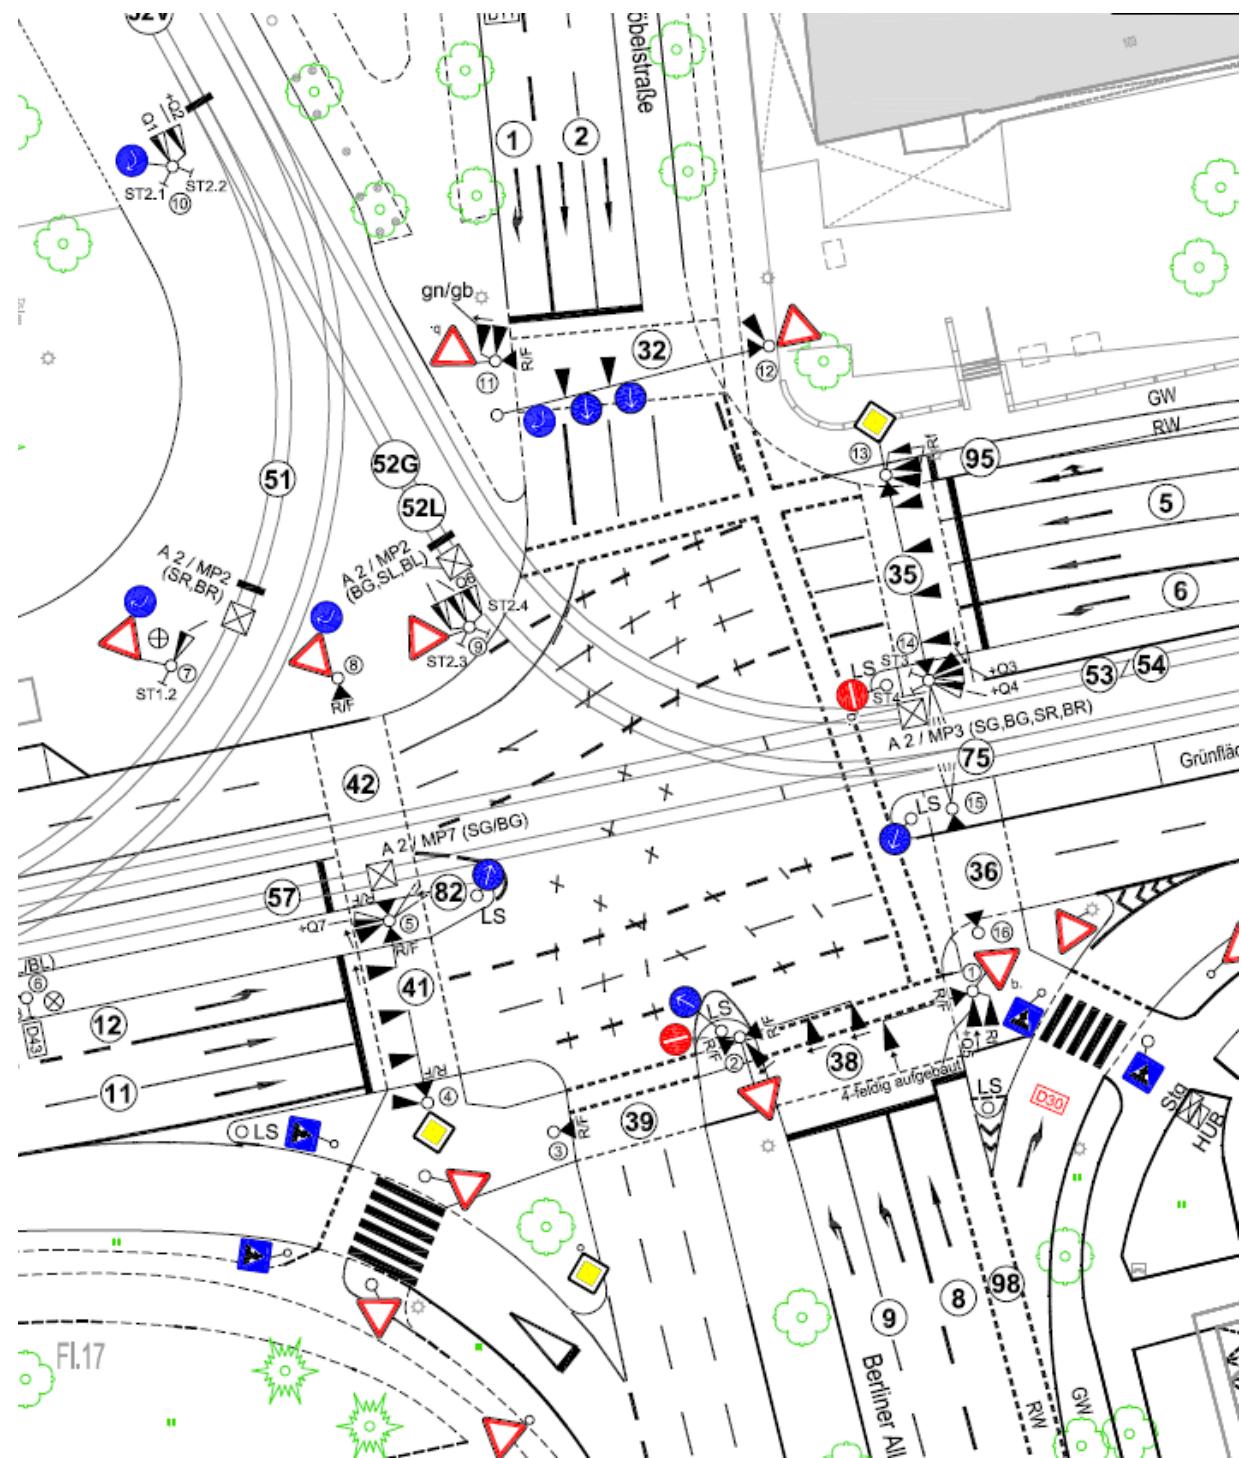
Junction layout of A2 Intersection, Darmstadt (Source: Darmstadt Town hall)
